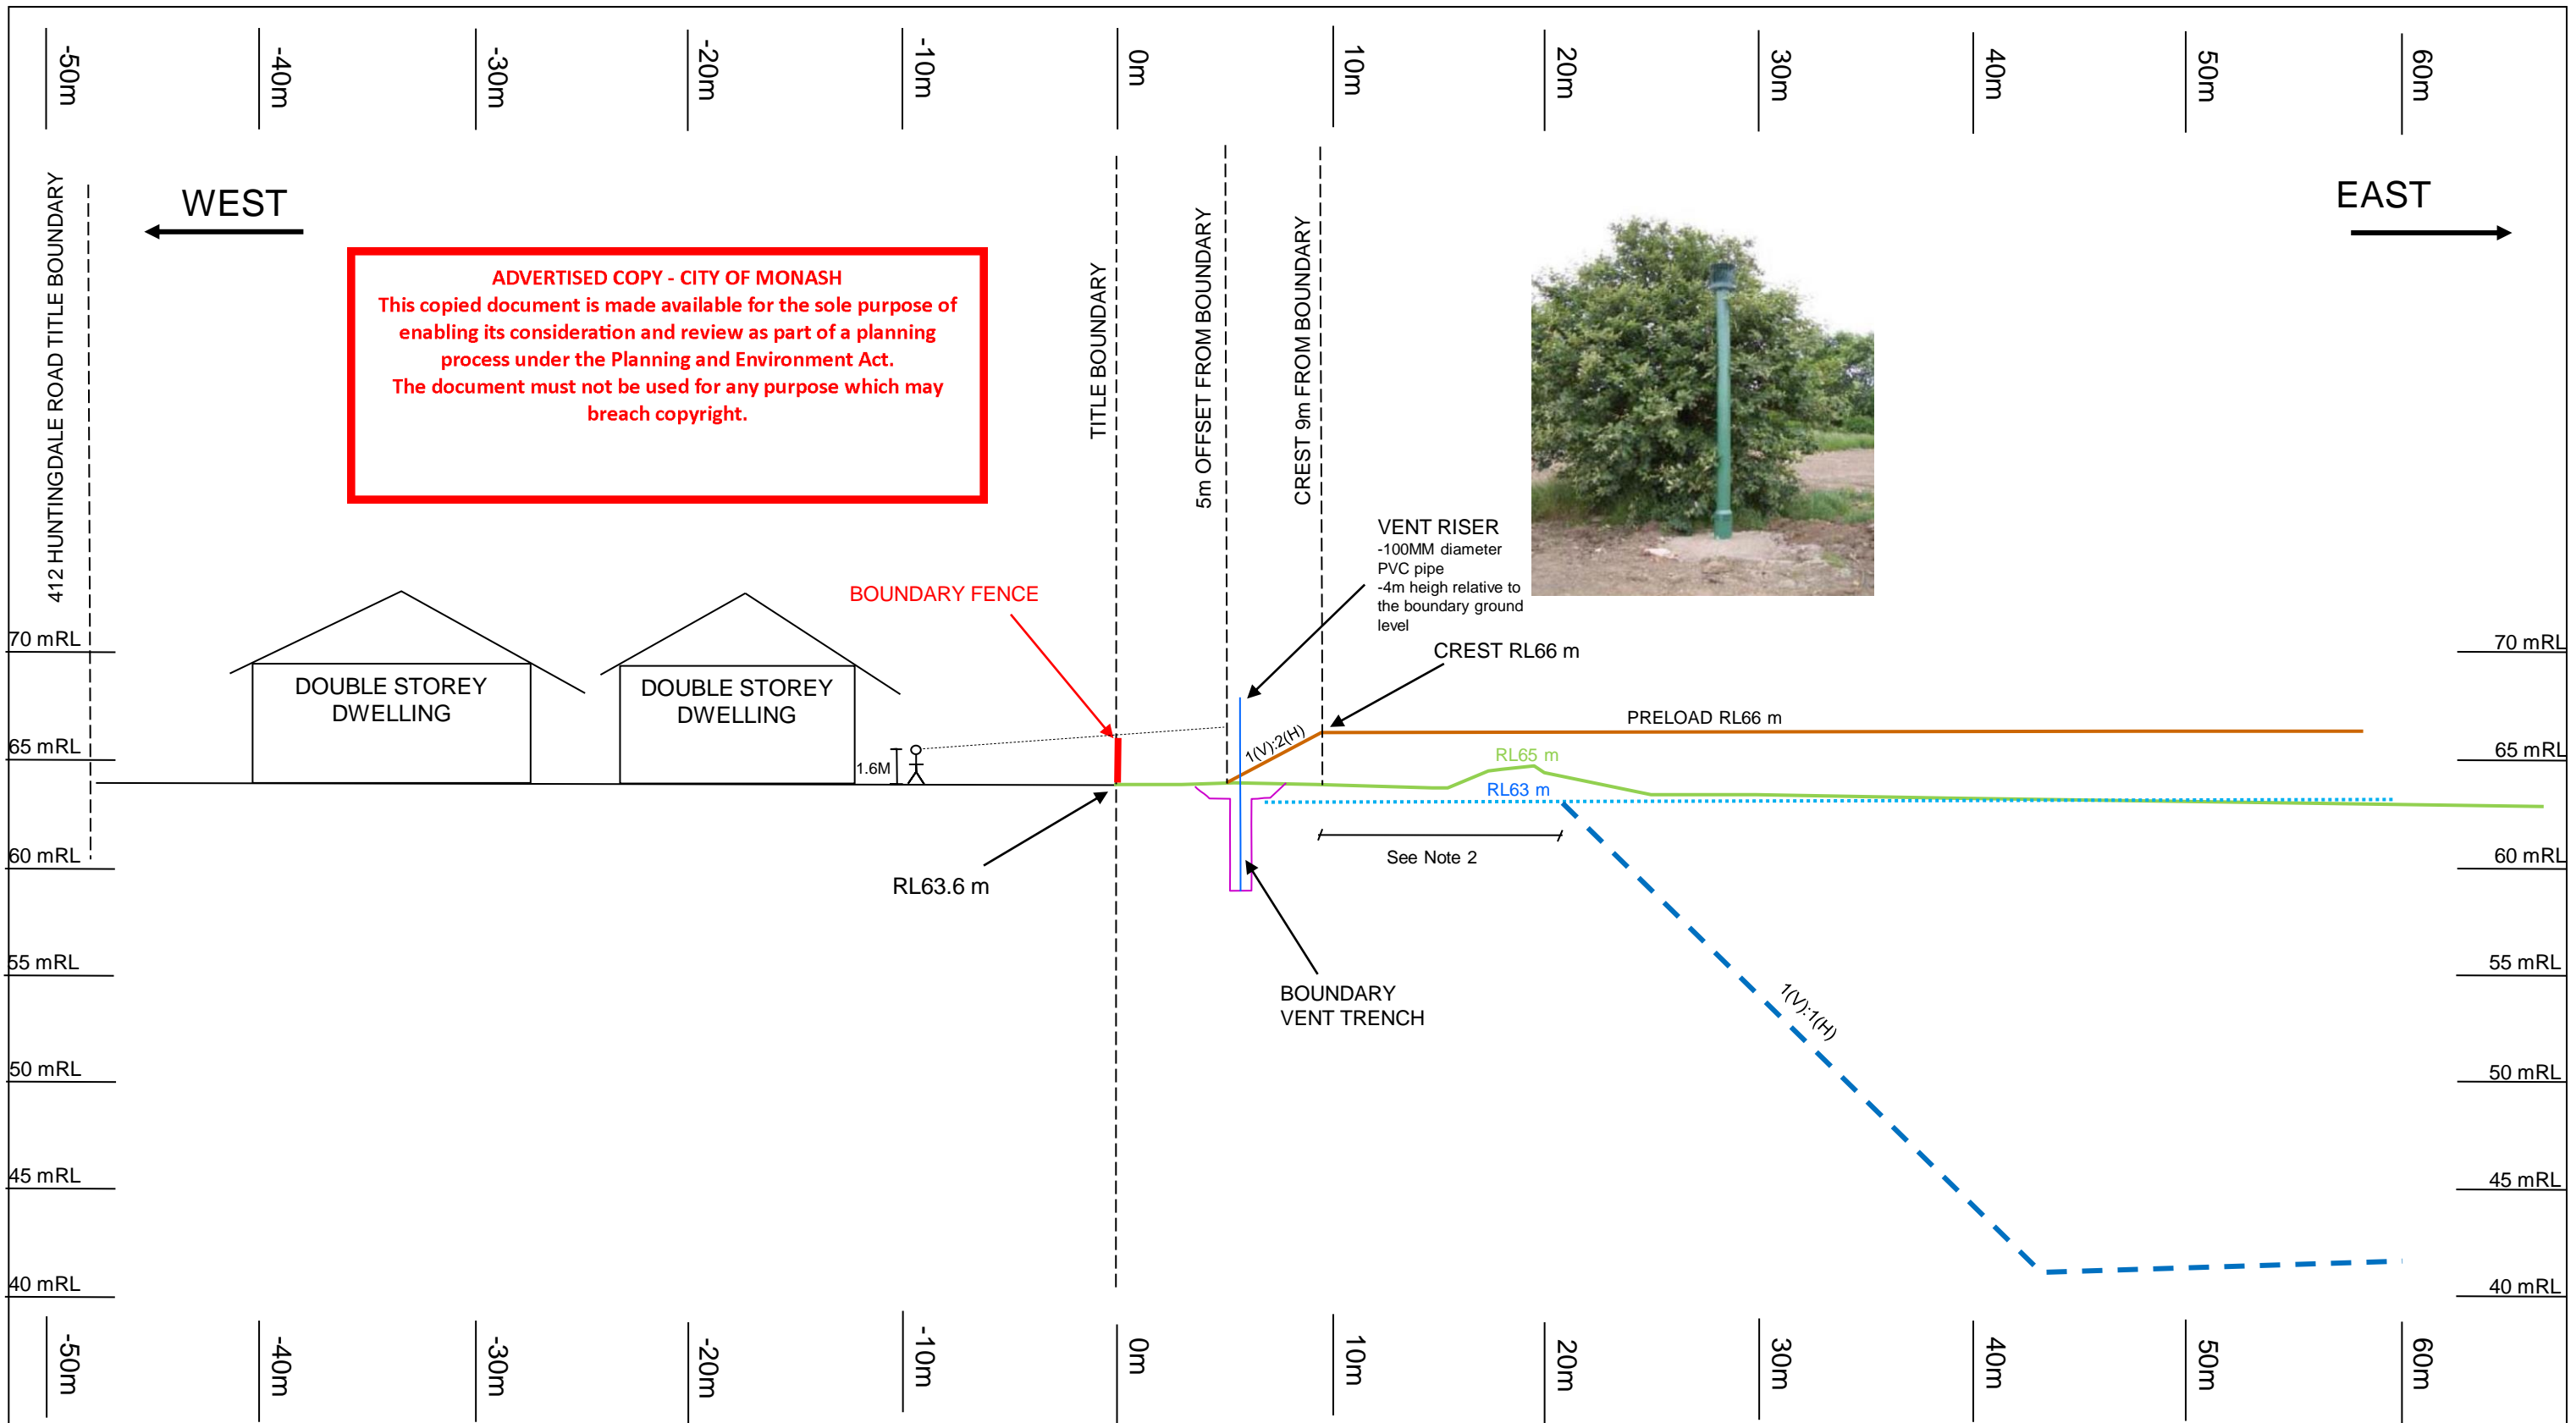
2/426 HUNTINGDALE ROAD CROSS SECTION
